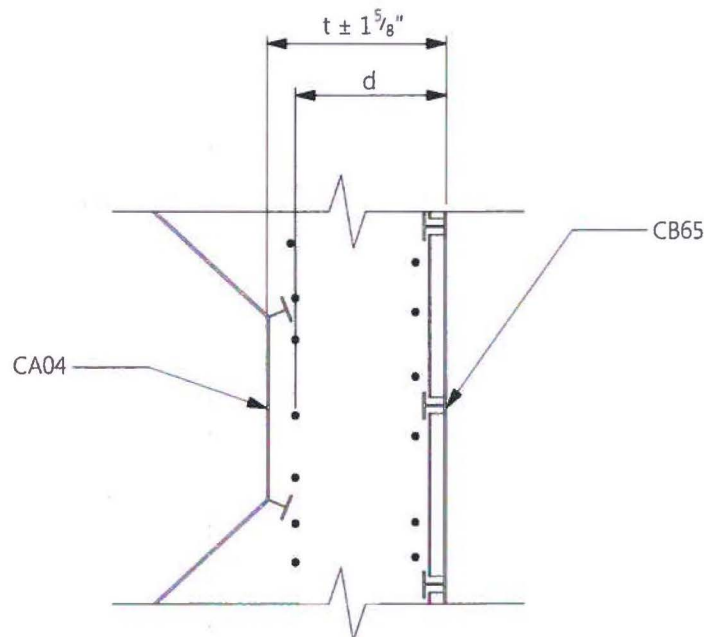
Concrete Cross-Section between CA04 and CB65 (not to scale)
